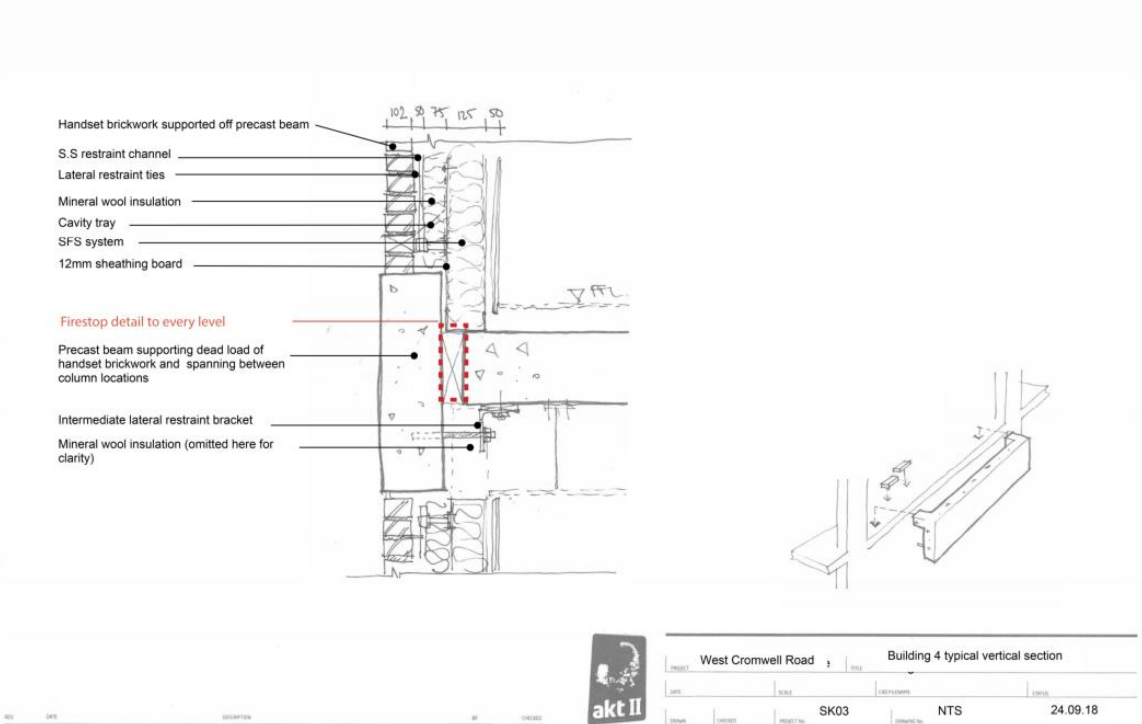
Building 3, 4, 5 - Wall Detail Courtyard Facing
